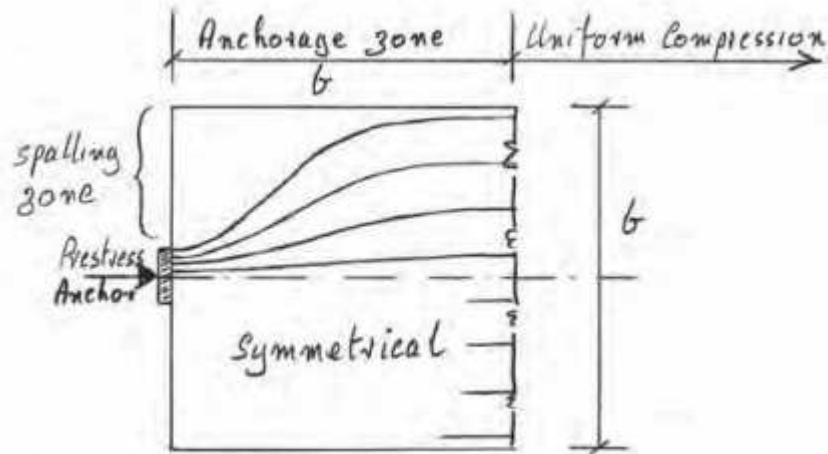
Stress mechanism behind a prestress anchor (Benaim, 2008)
